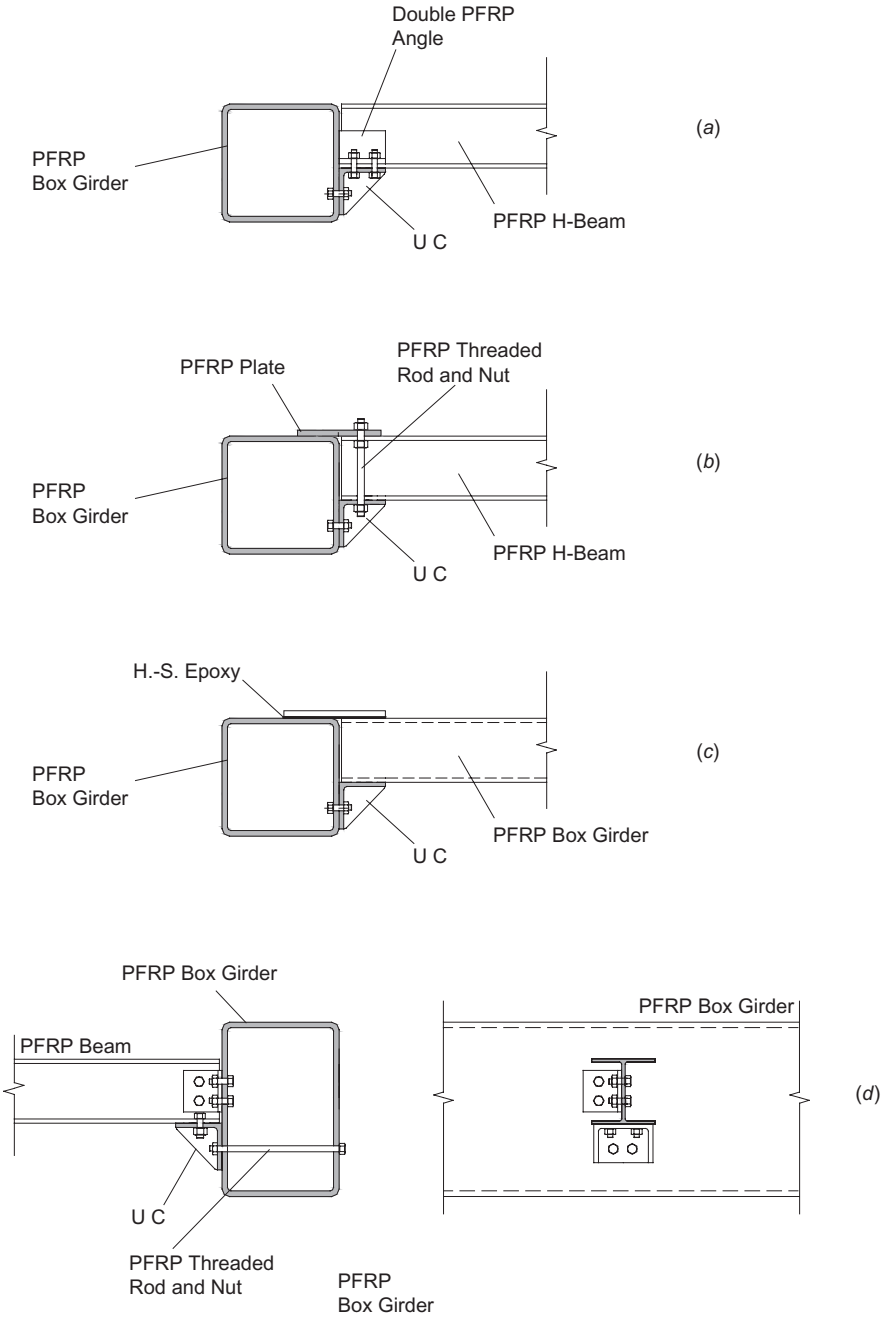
Flexible PFRP beam-to-girder and beam-to-beam connection details (exterior).
